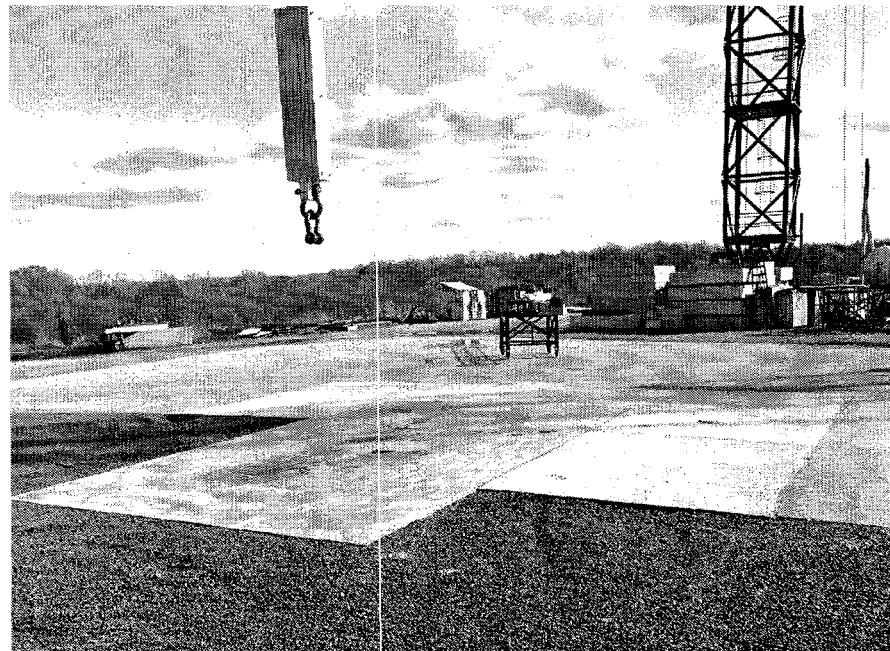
The Armor Plate Surface of the Impact Pad Surrounded by a Concrete Edging.
